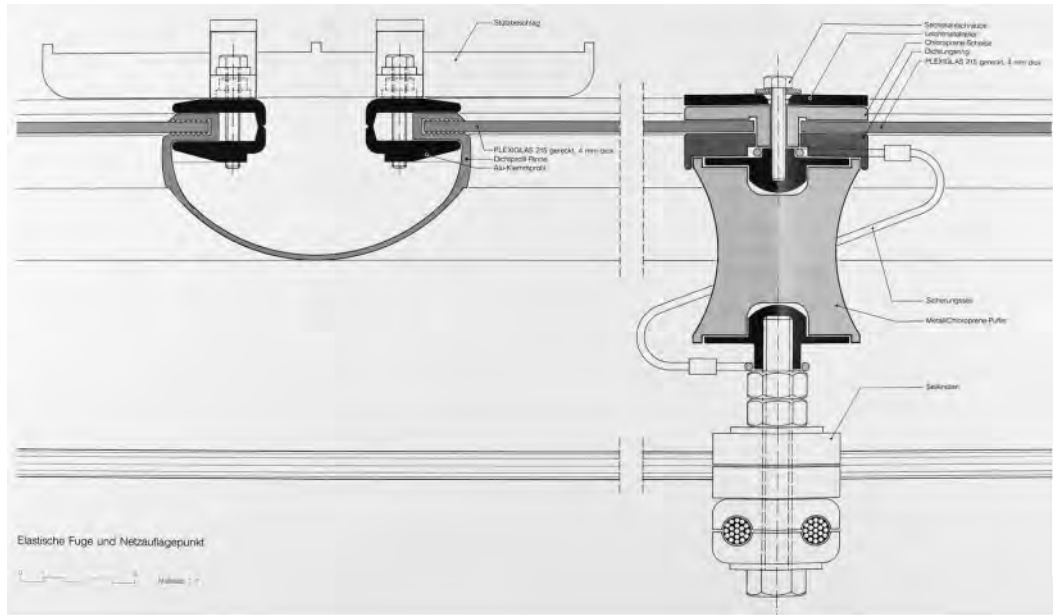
Cross section of the Plexiglas construction elements and their conjunction on the Olympic roof (Röhm GmbH 1989:2, 2.c.2).
